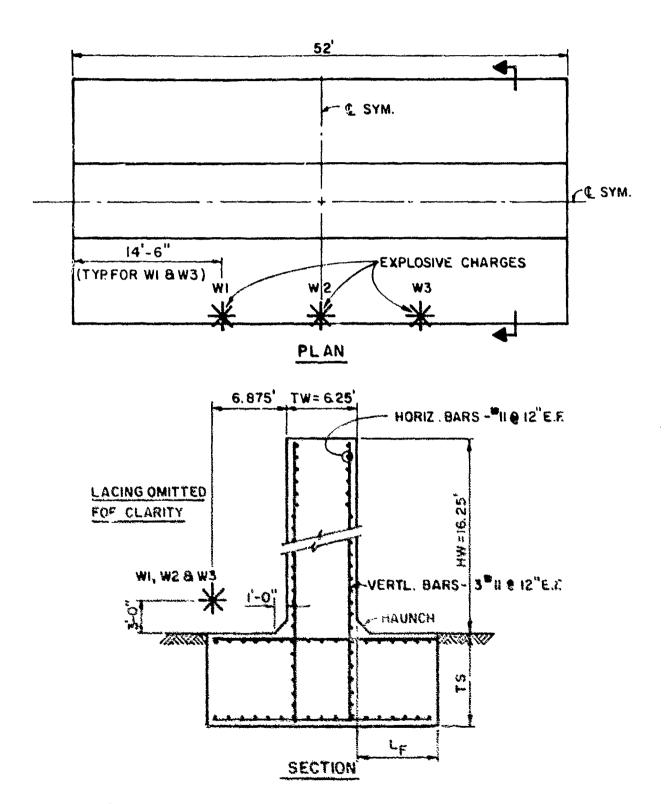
Example C.1: Dimensions of structure, design details of backwall and charge locations.
